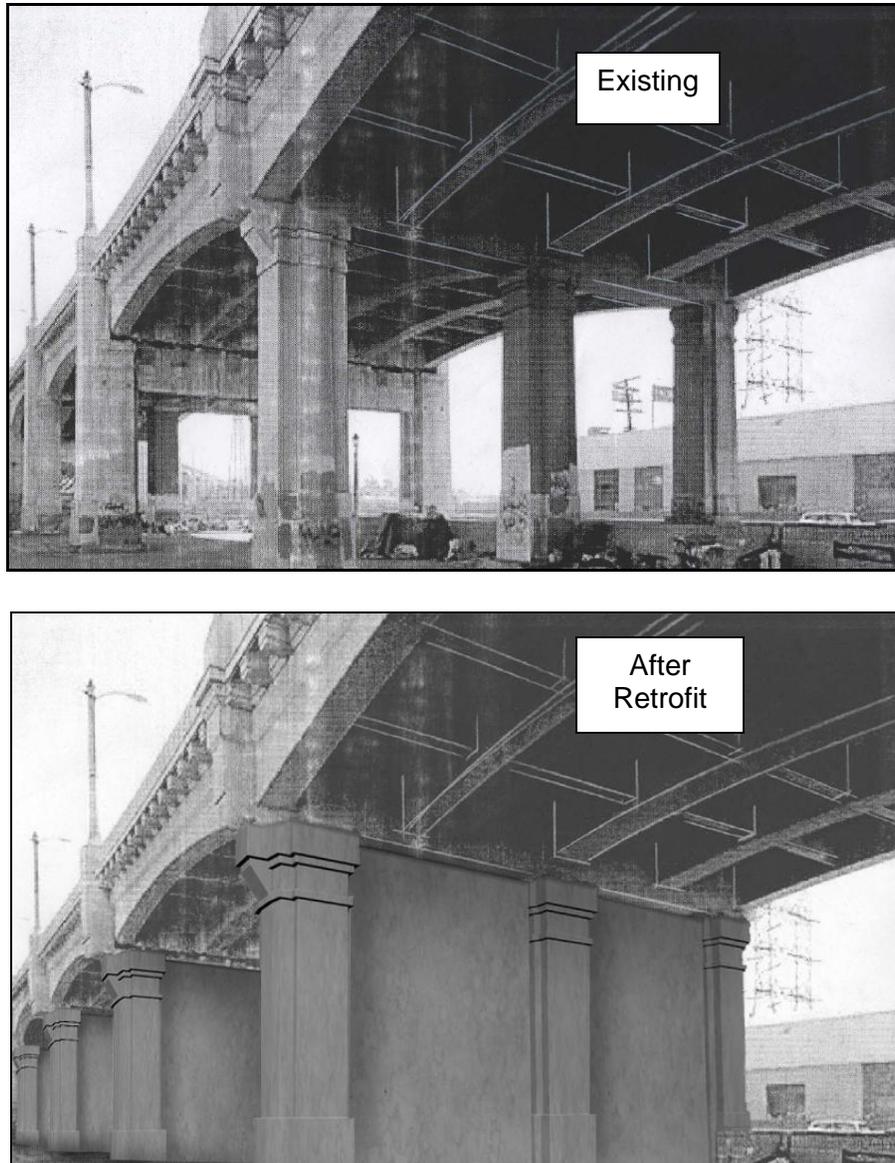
Conceptual Drawing Alternative 2 – Retrofit
